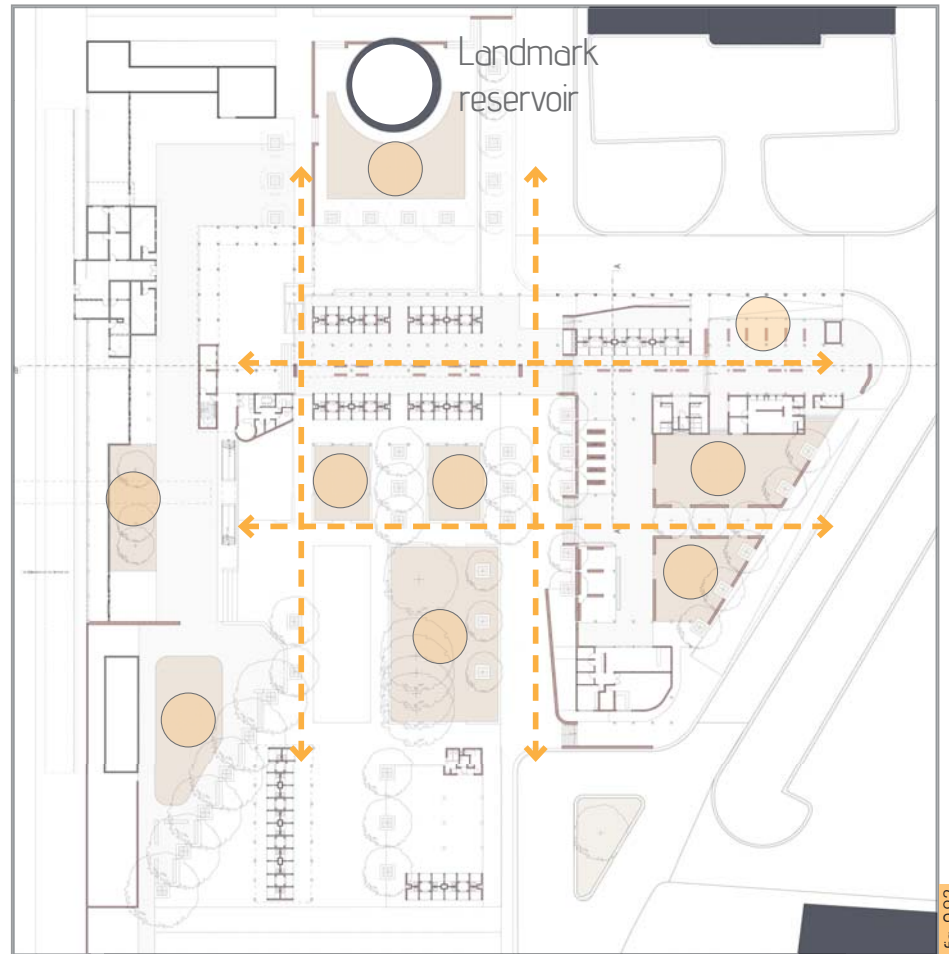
Plan illustrating pedestrian circulation through stalls
